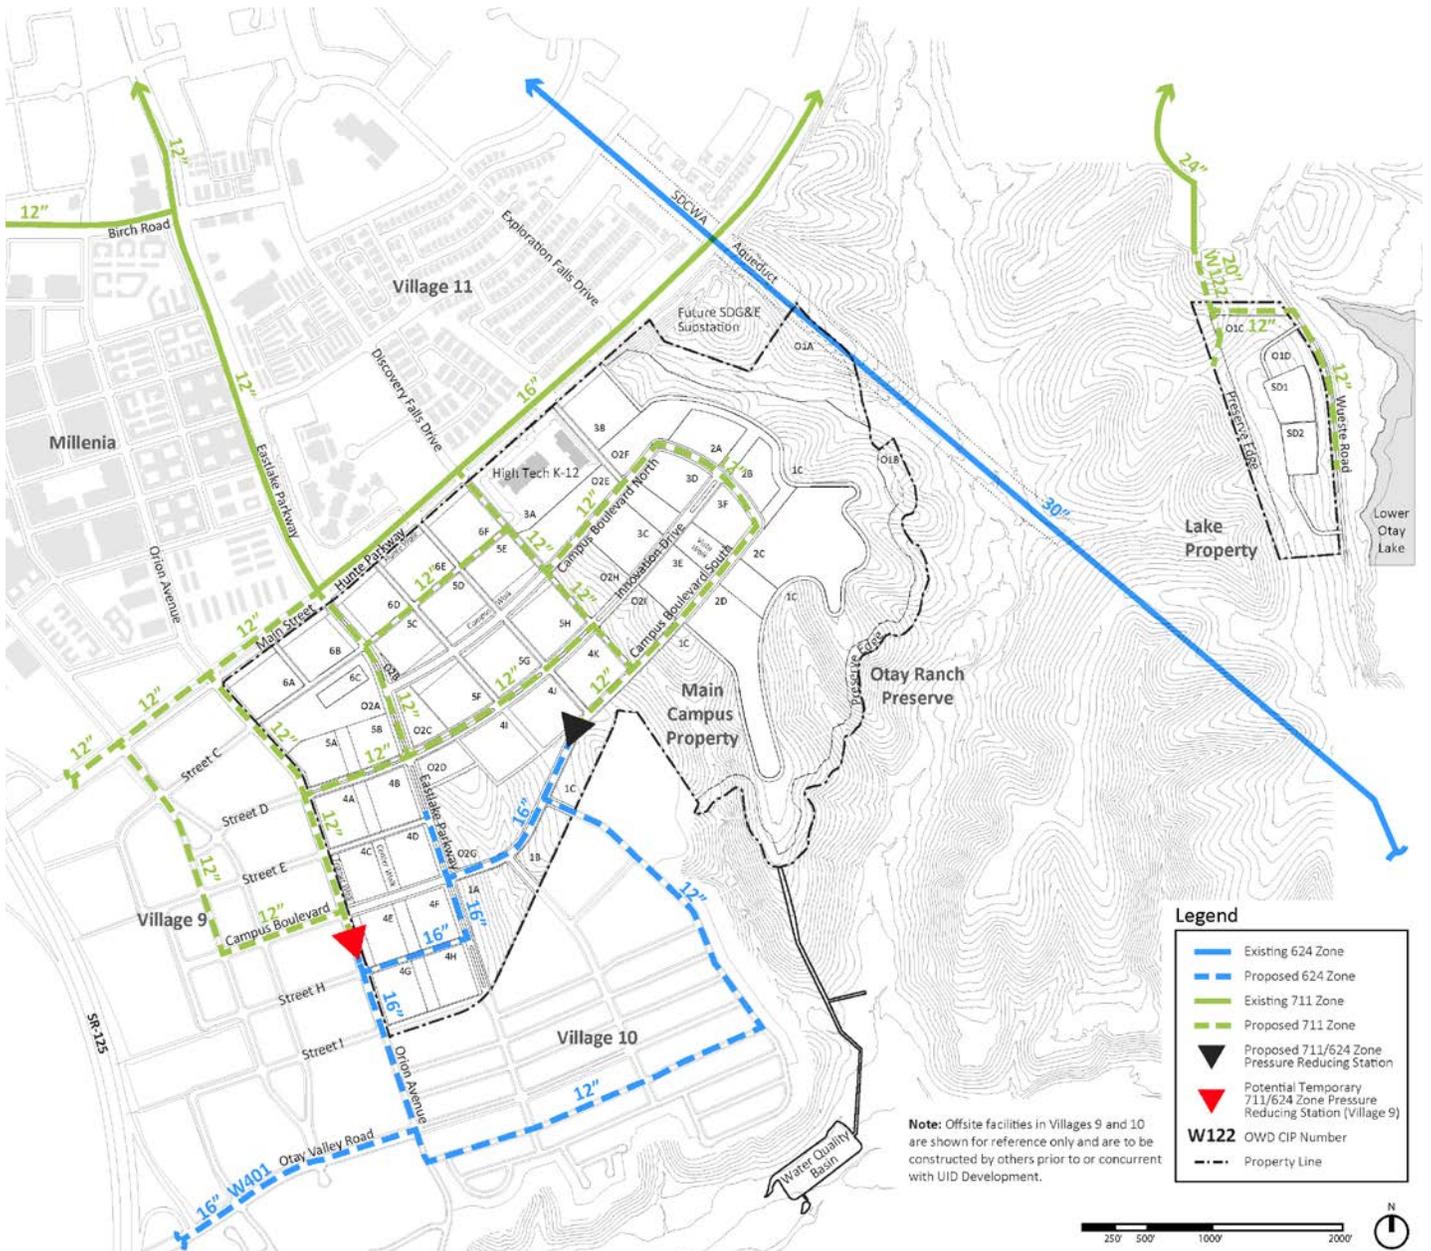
B: CONCEPTUAL POTABLE WATER PLAN
